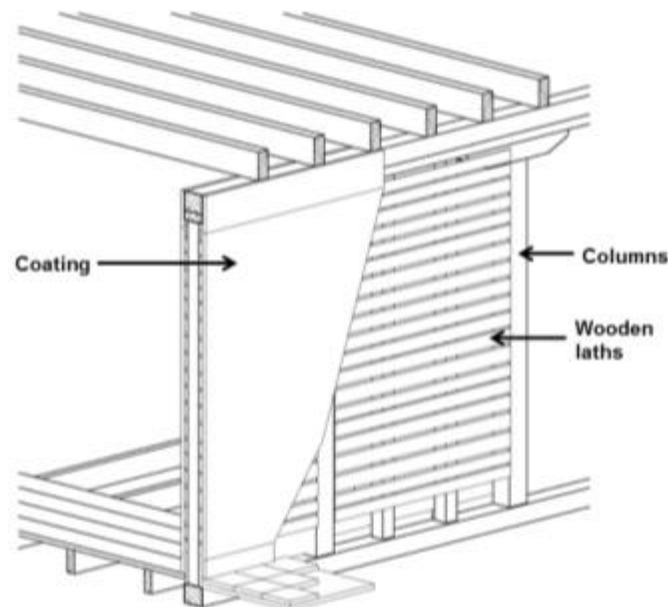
Structural detail of the inner *bagdadi* wall [11].
